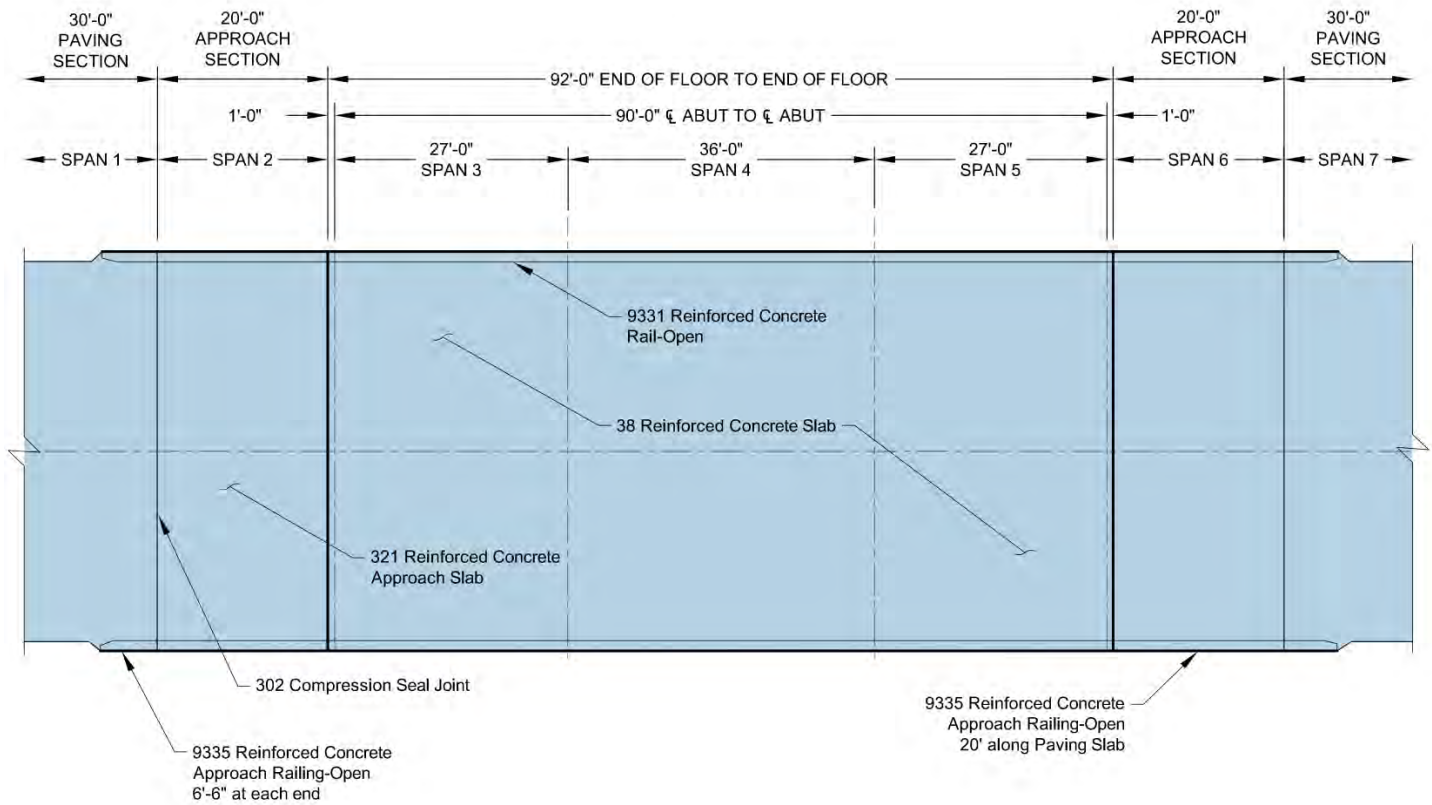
EI.24.3-2: Plan view of continuous concrete slab bridge
